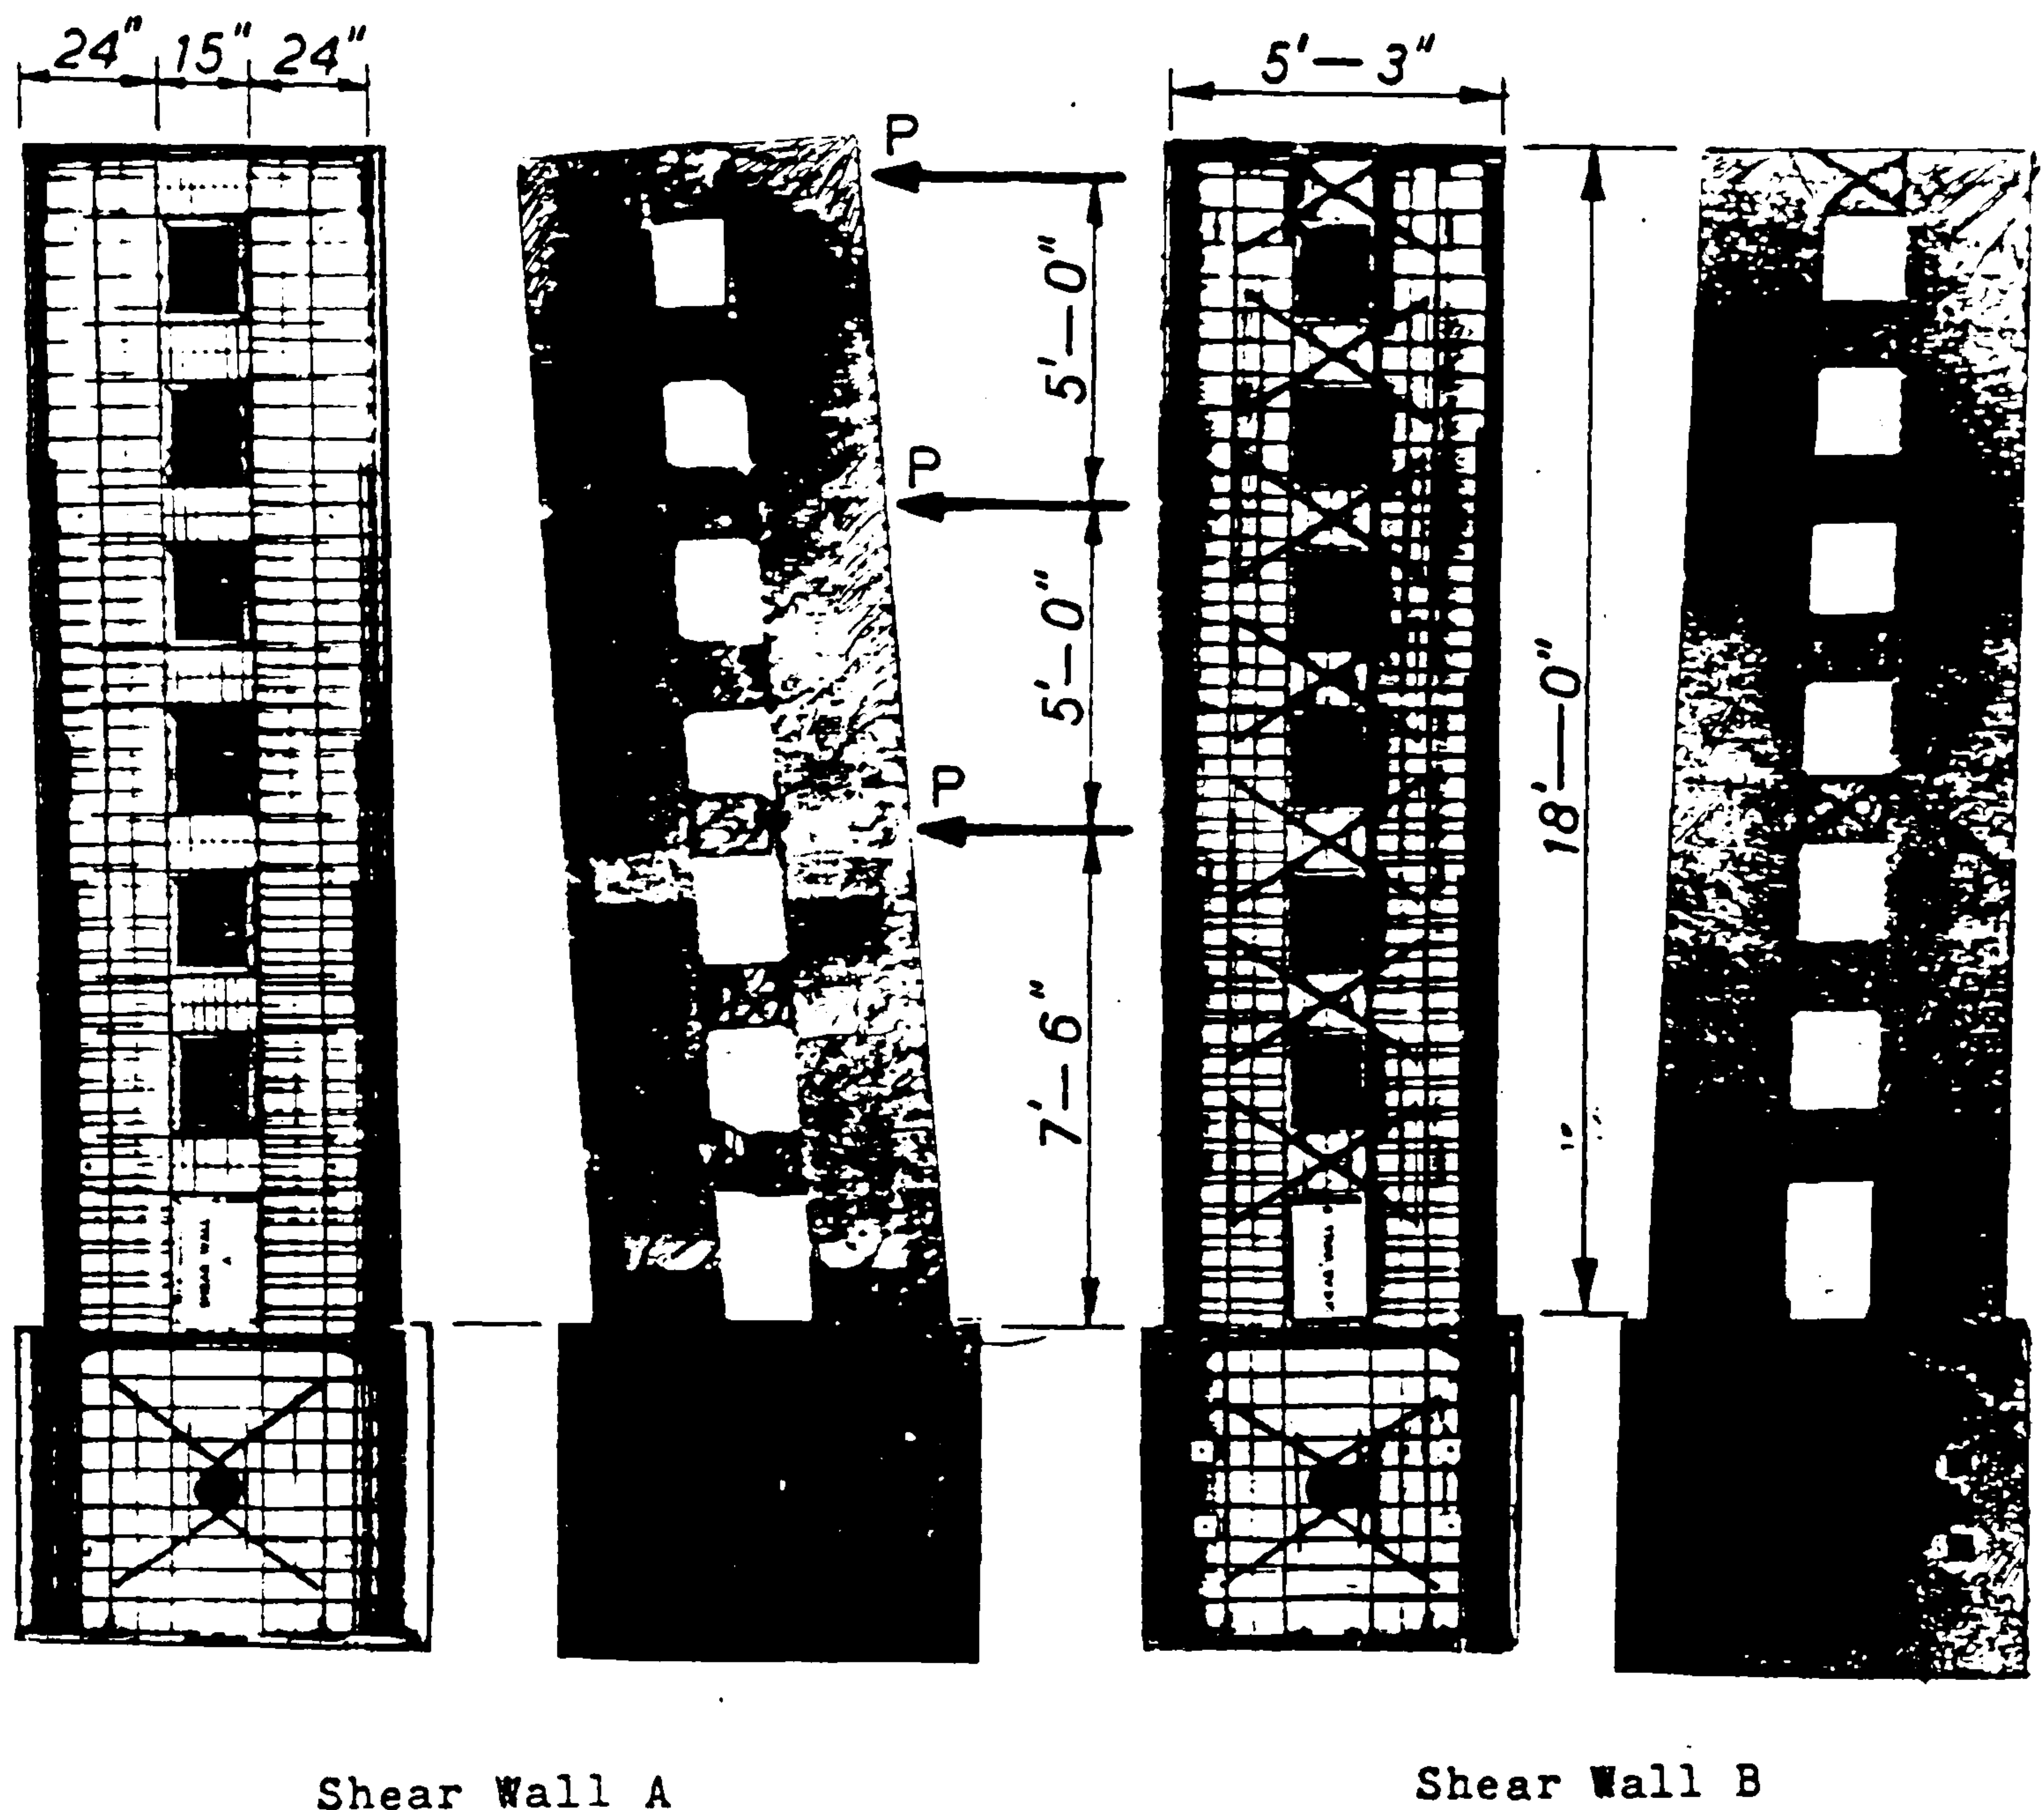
Reinforcement and crack pattern in two quarter full size shear wall models subjected to reversed cyclic loading. Paulay and Sunthkumar [52]
